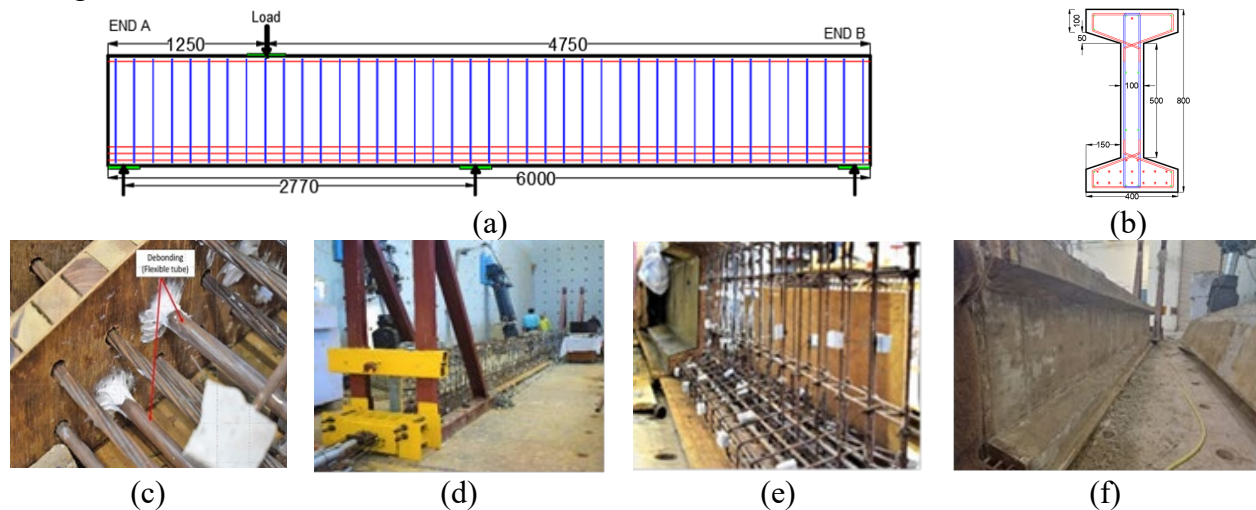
Details of the fabrication (a) plan view; (b) cross-sectional view; (c) debonding of strands; (d) casting bed; (e) close-up view of stirrups and formwork; (f) removal of formwork
